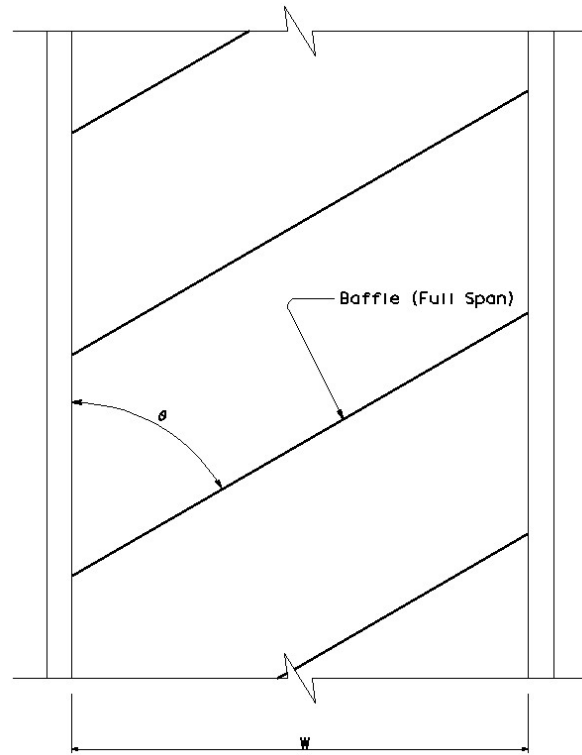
Top-Angled Baffle (Full-Spanning) Plan View
